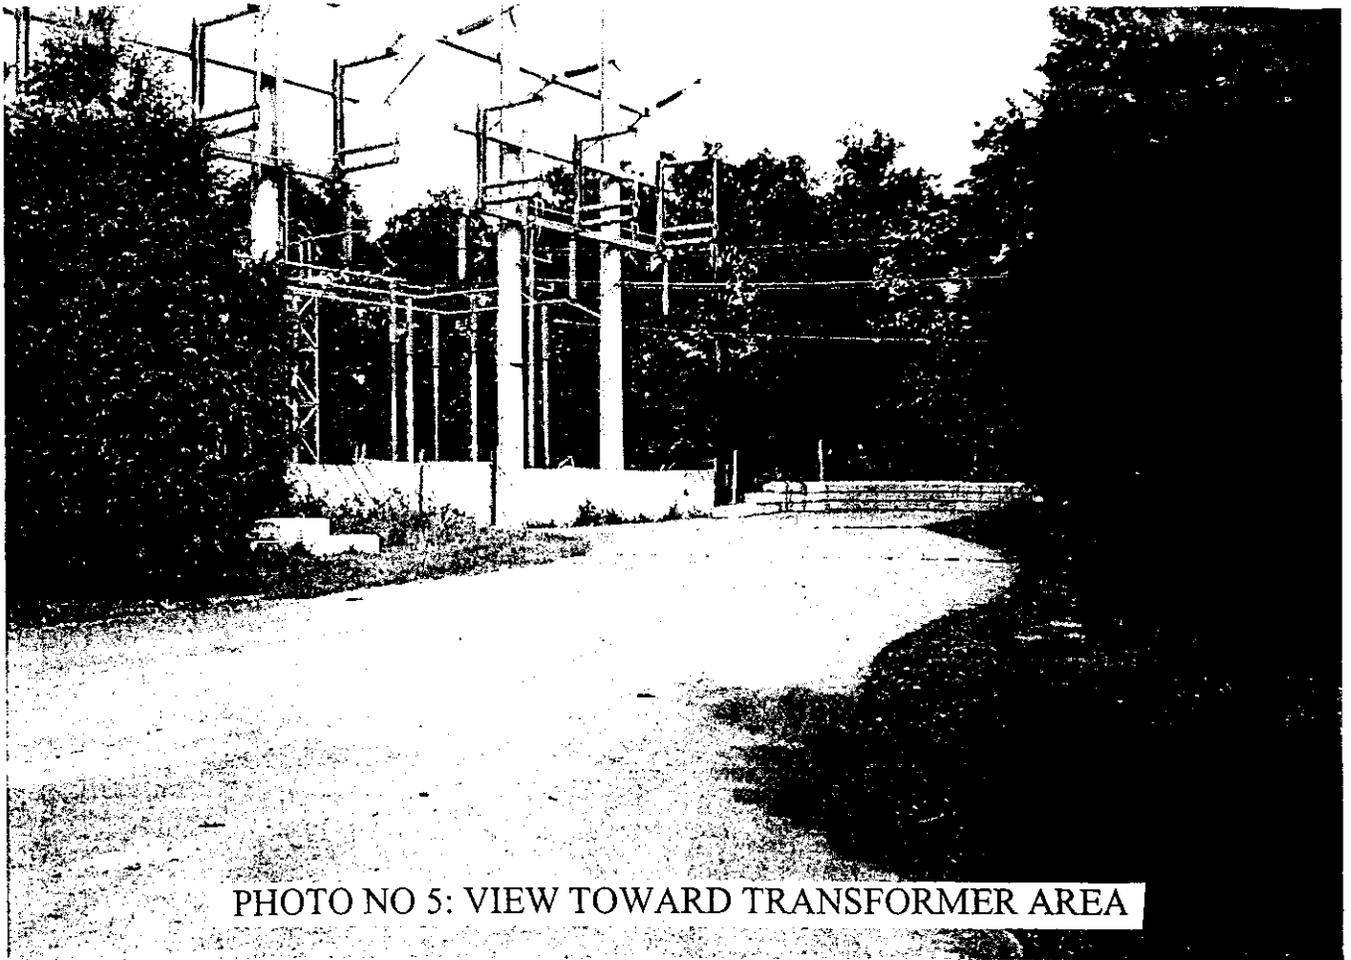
VIEW TOWARD TRANSFORMER AREA
